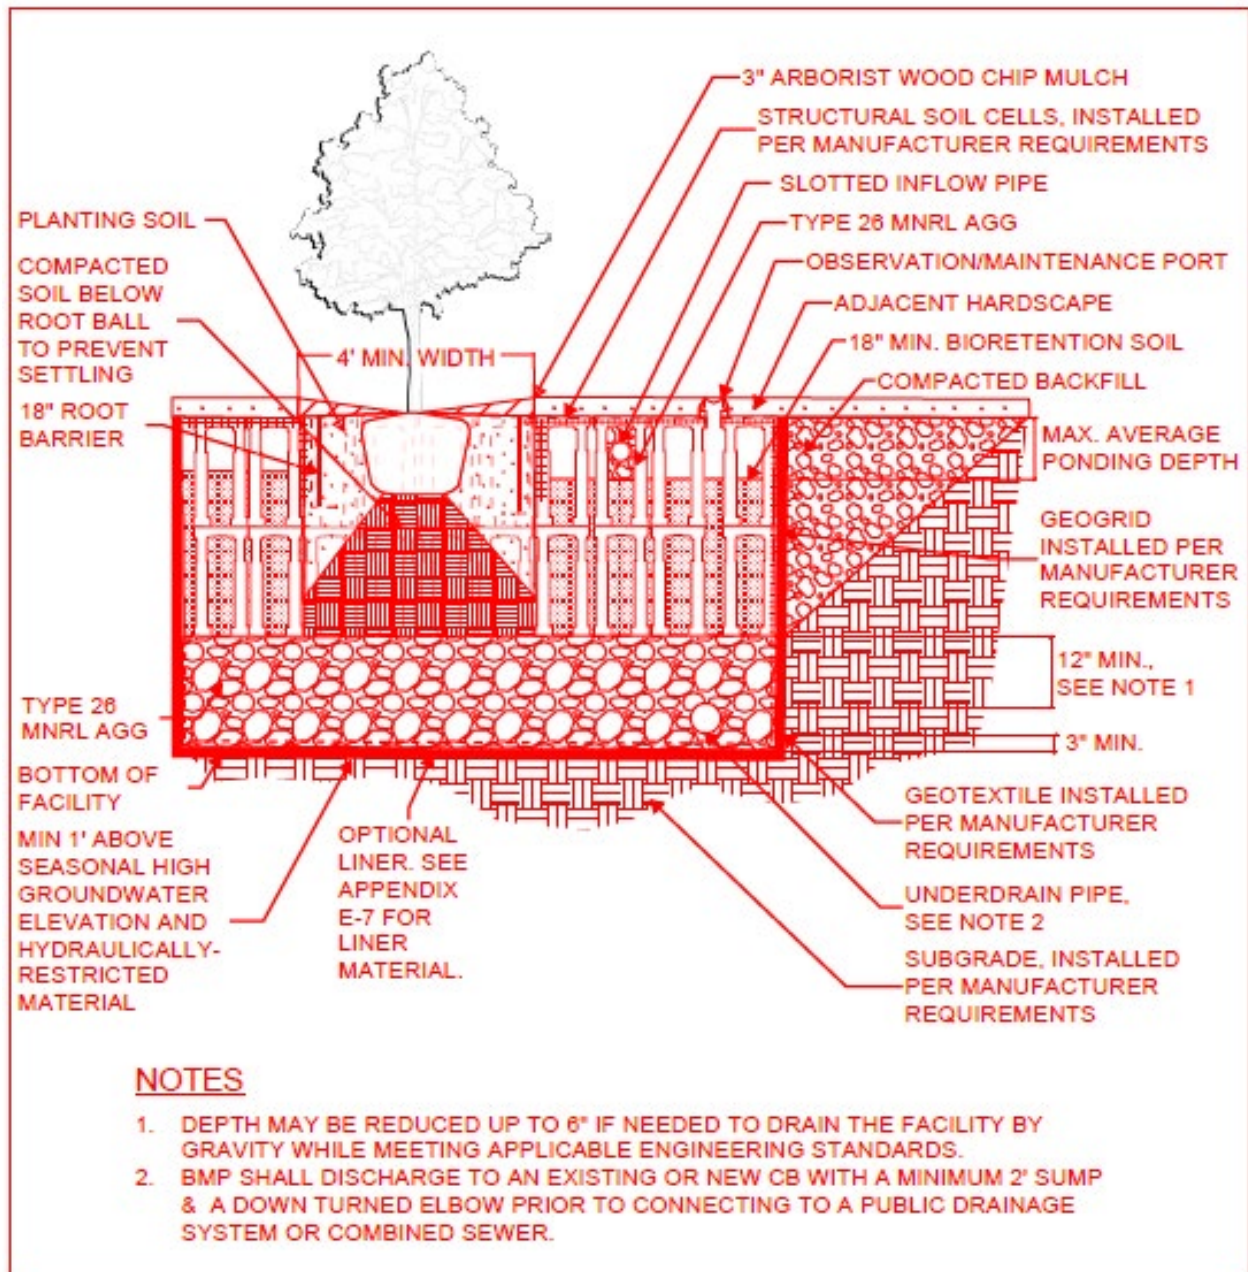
Non-infiltrating Structural Soil Cell BMP. (New Figure)
